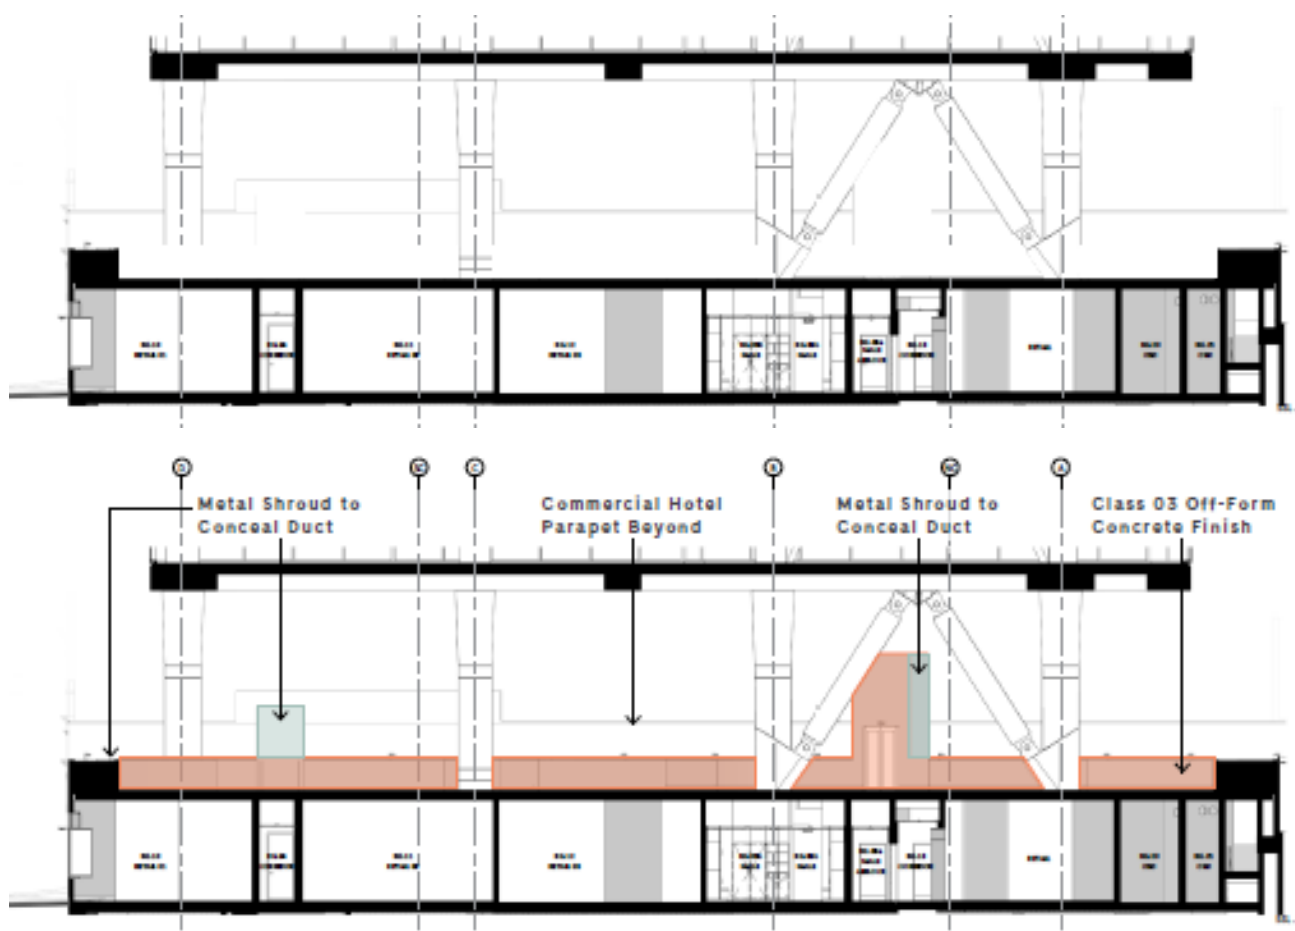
Approved Section Looking West (top), Proposed Section Looking West (bottom)
